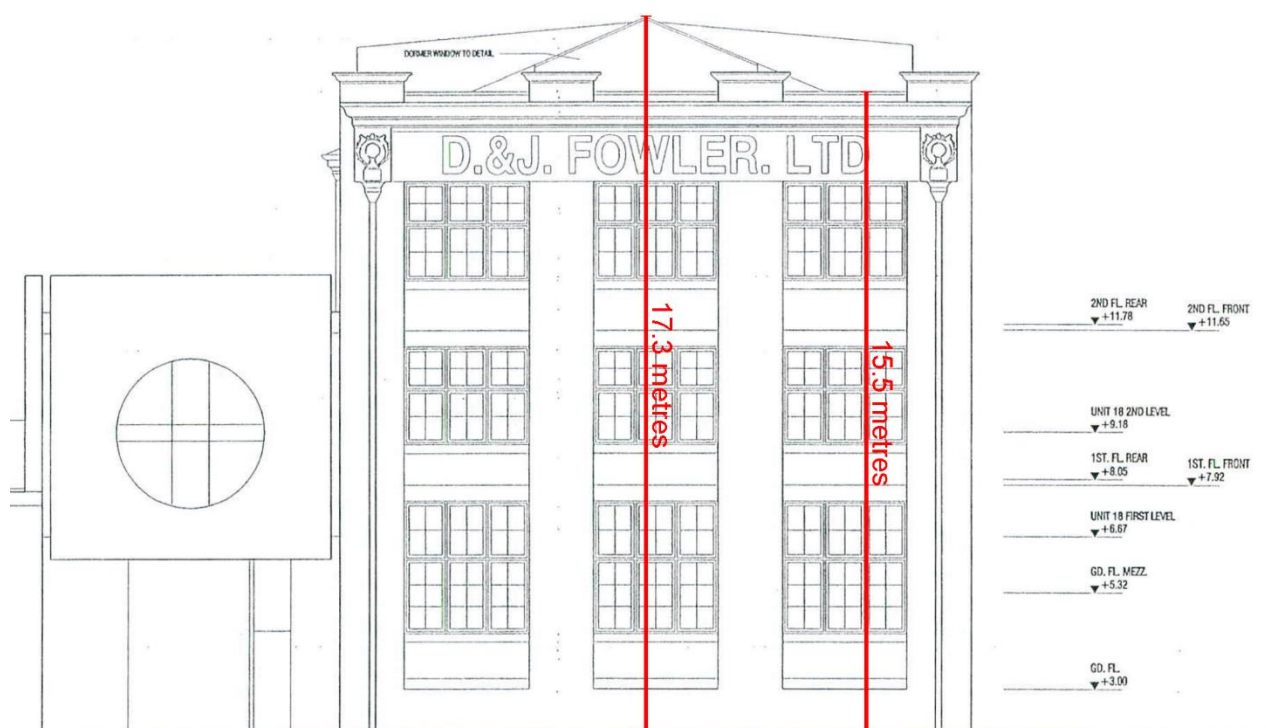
Pakenham Street (east) elevation of the mixed use development at 33-35 Pakenham Street (D & J Fowler Building) north of the subject site. Note: Maximum building height of 15.5m (parapet) to 17.3m (roof ridge).
